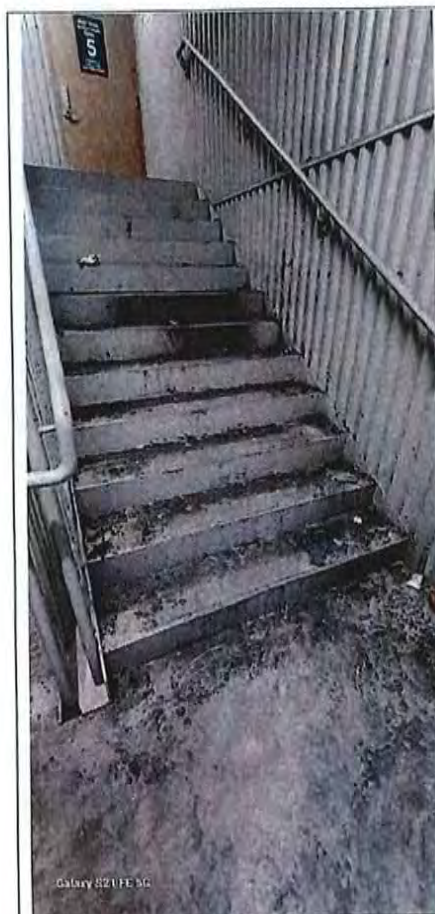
Soot, ash and debris from fireworks, 4th-5th floors – east stairwell.
